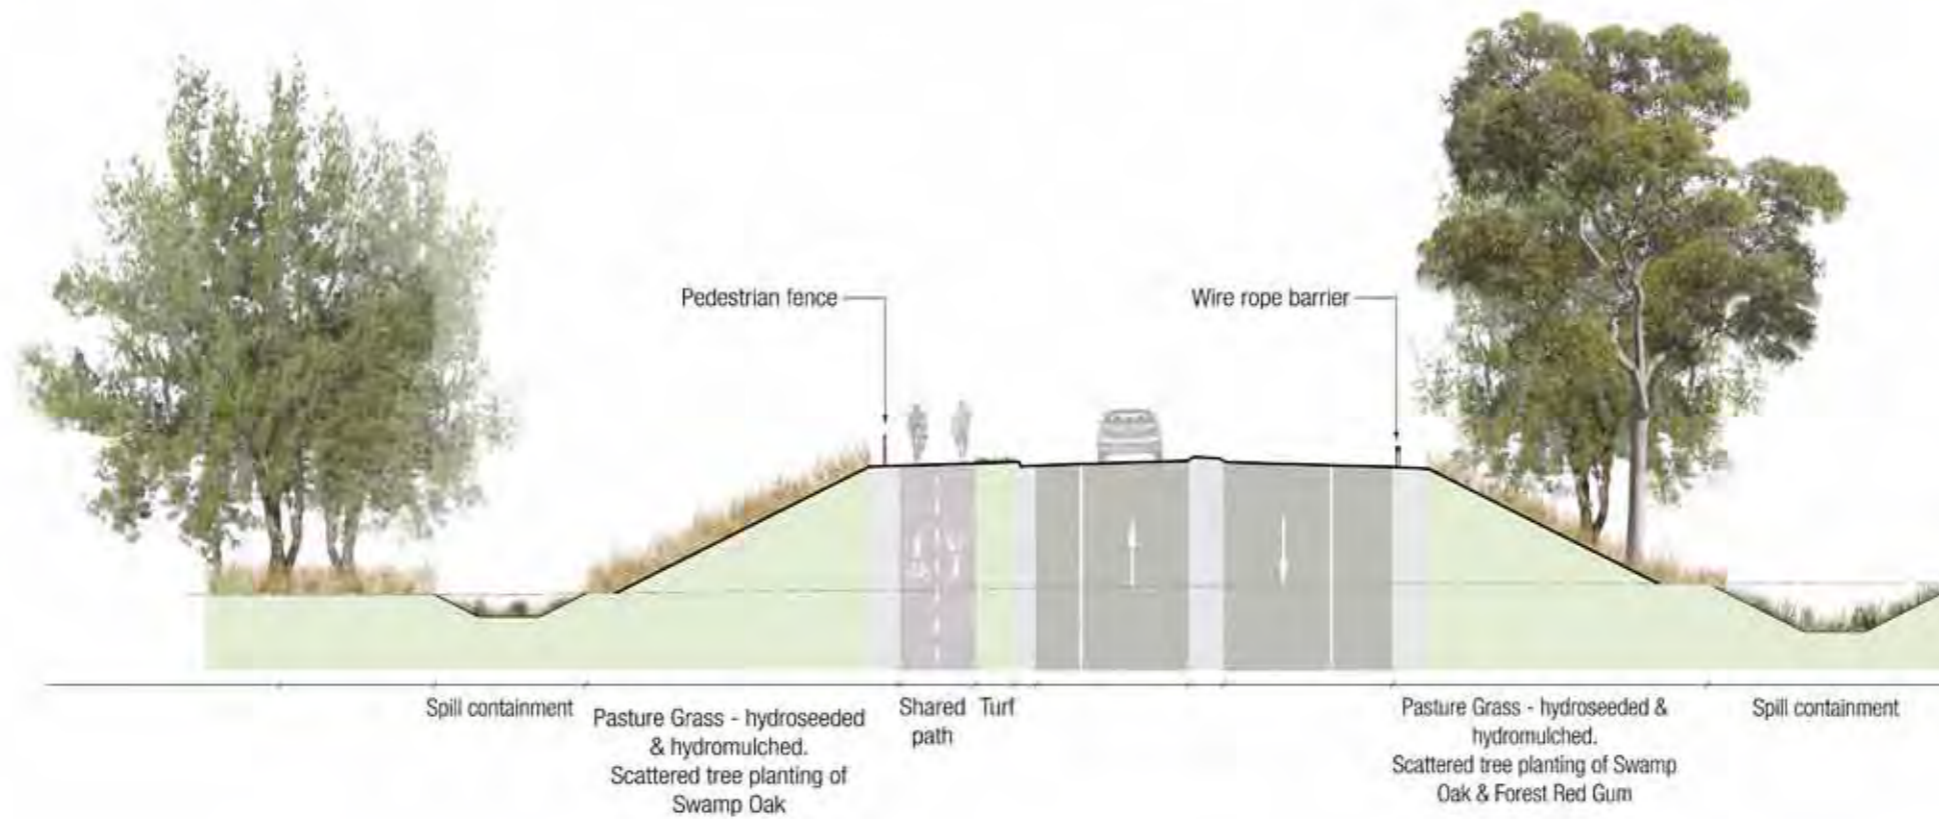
Cross section at southern approach - Ch 775 (Scale 1:250)
